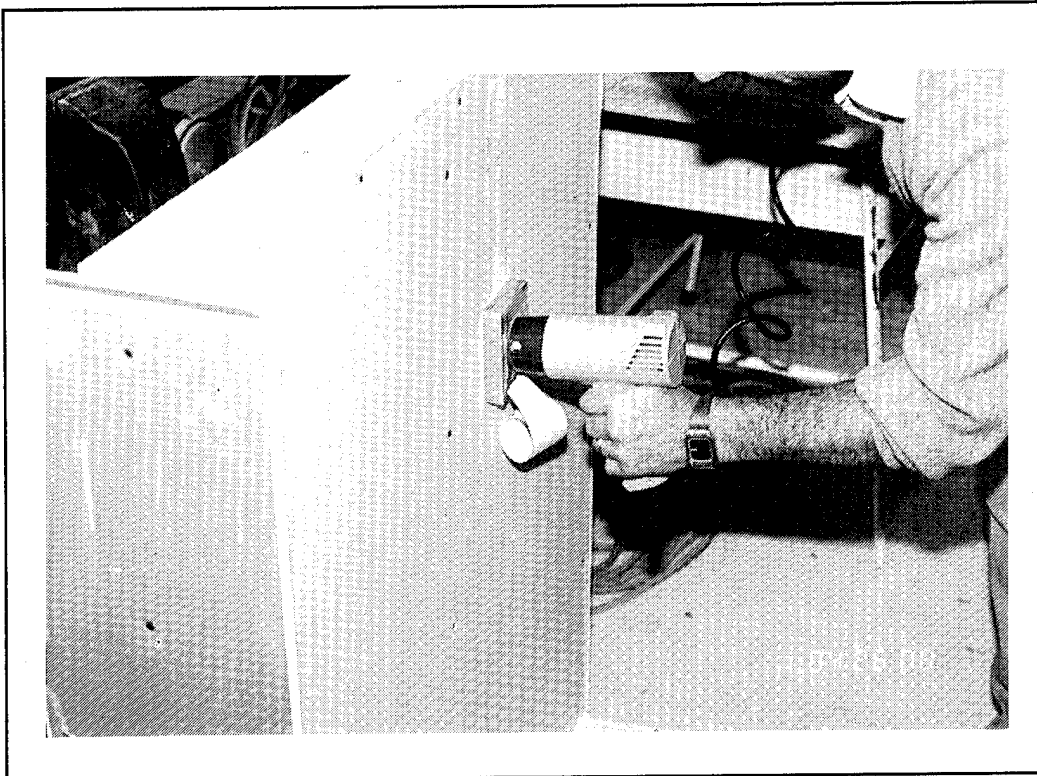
Special heat gun to apply adhesive-backed joint finishing tape.
